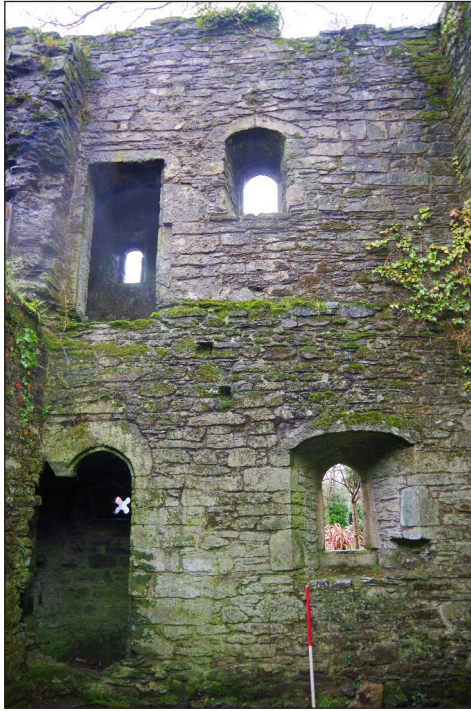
West elevation of north wing of Betsy Grimal's Tower, looking west-southwest. (1m scale)
